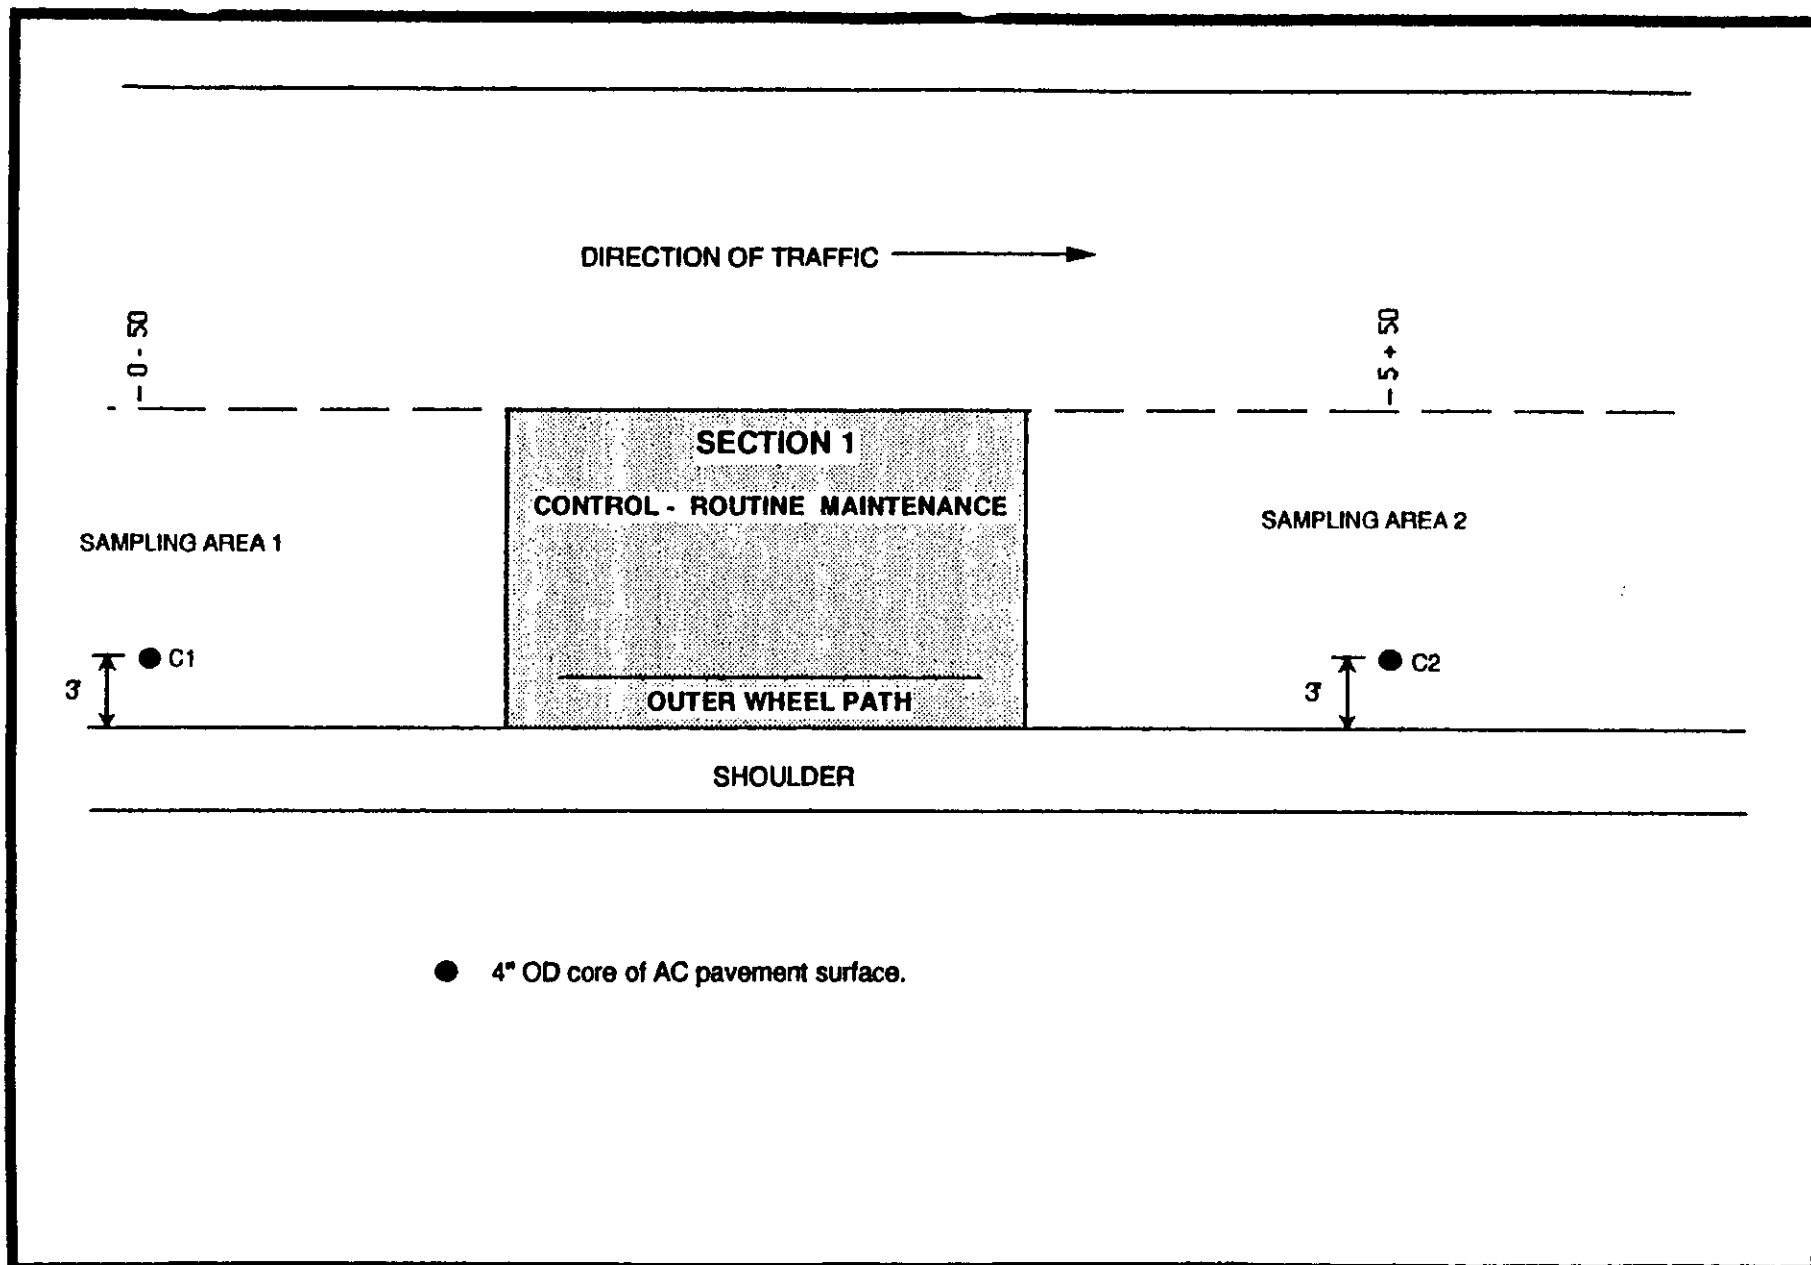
Example of "Pre-Construction" Sampling Plan for Section 1.
